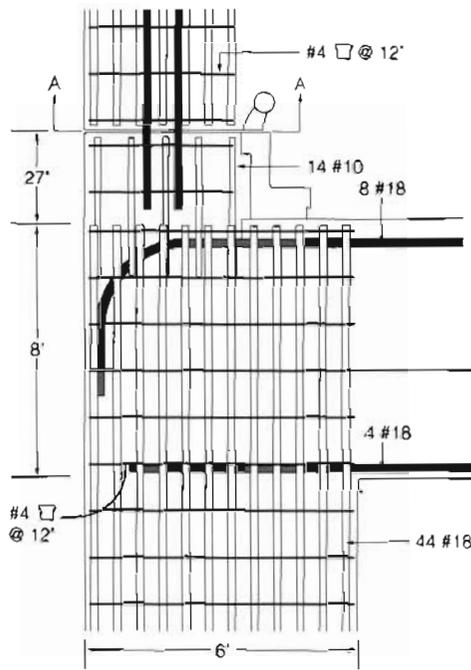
Typical connection detail 2—B1 bent lower girder-to-column connection.
